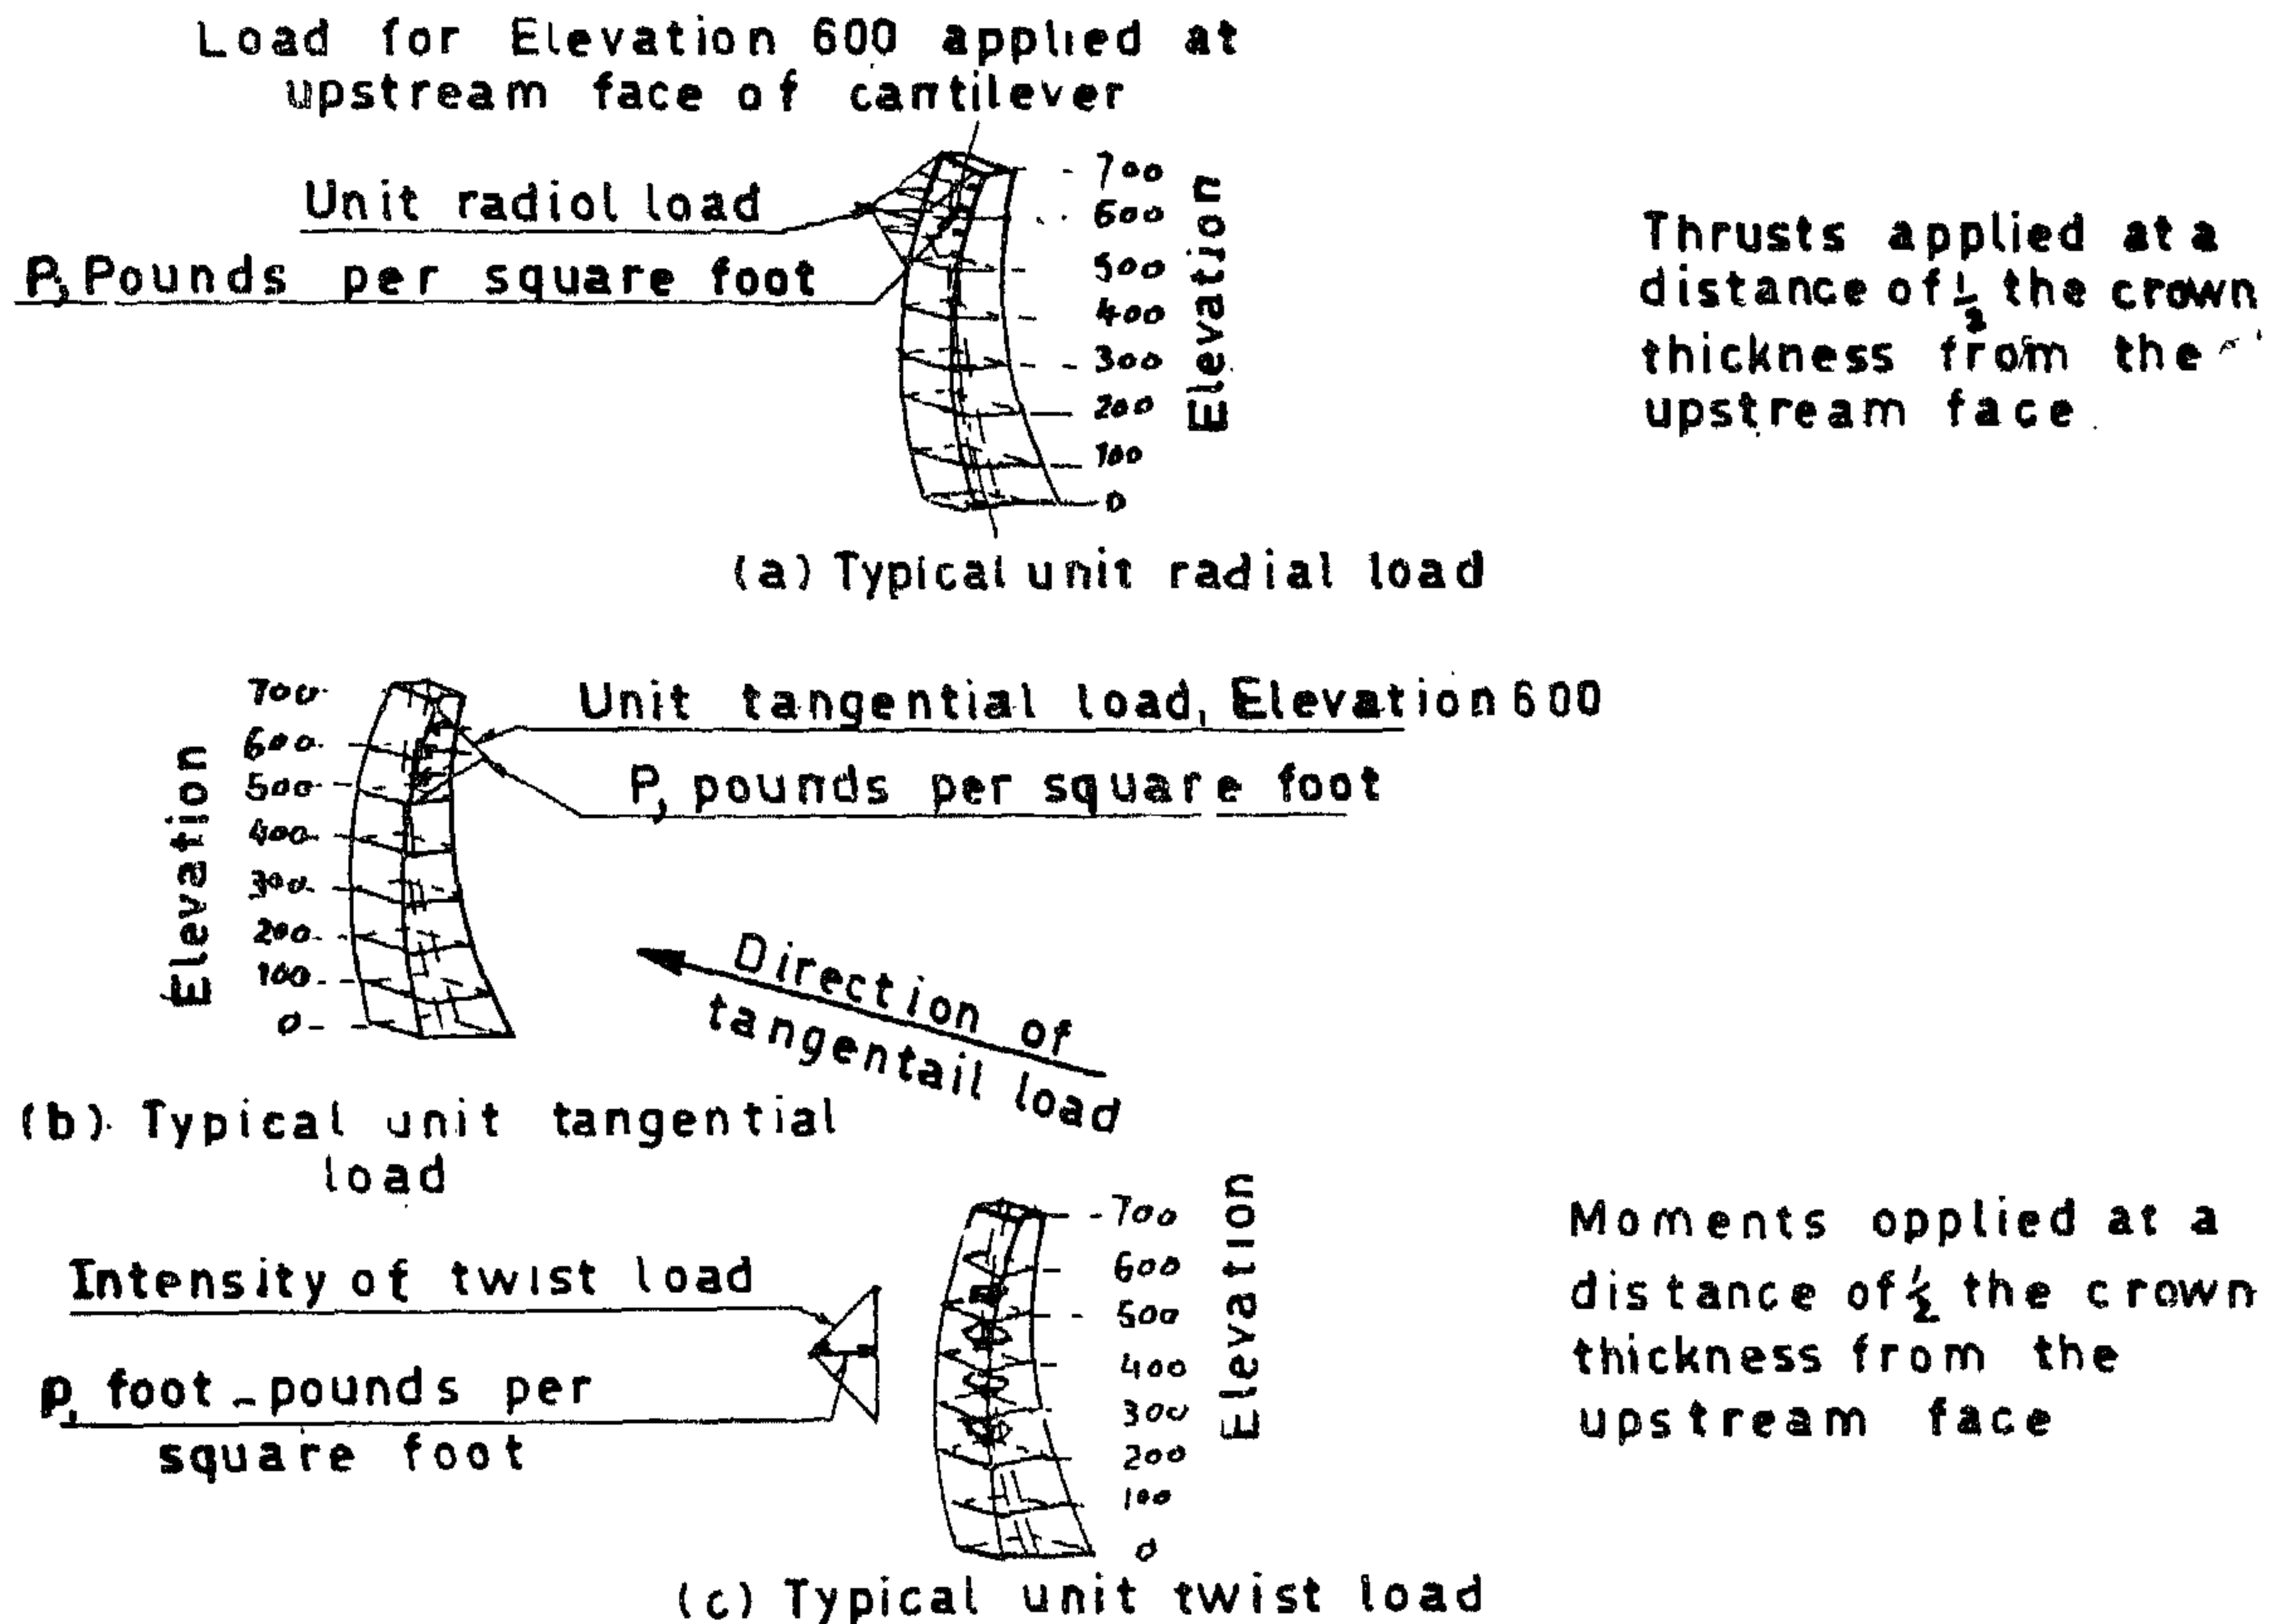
TYPICAL UNIT CANTILEVER LOADS
